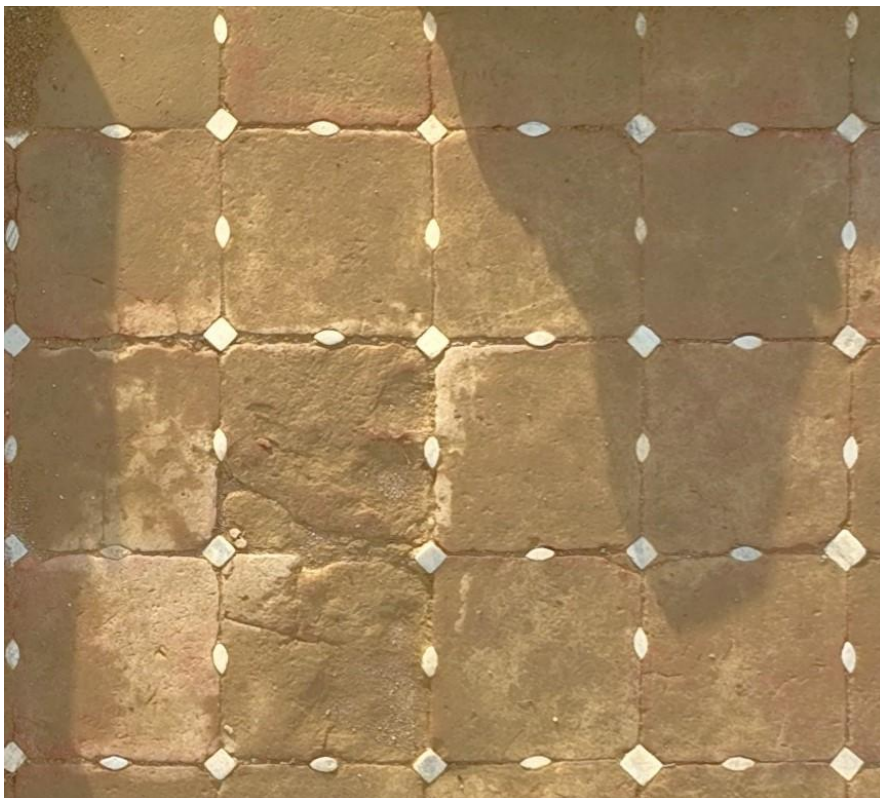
Detail view of the brick pavement decorated with opus sectile fragments (IAM archive)
